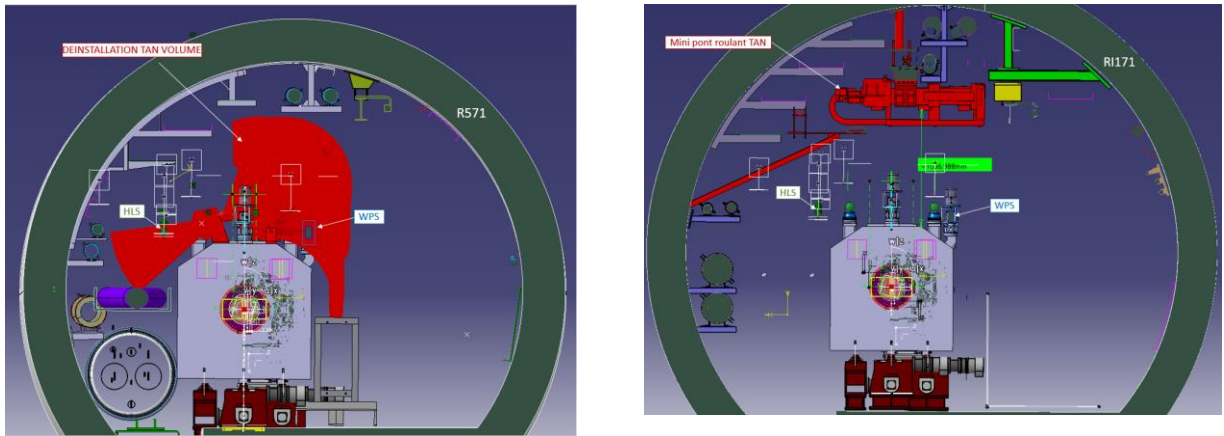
View of the TAXN inside the LHC tunnel and current auxiliary cranes used for handling the forward detectors inside TAXN. Left: CMS crane path will collide with surrounding equipment (mainly alignment wire positioning system). Right: ATLAS crane principle will be kept.
